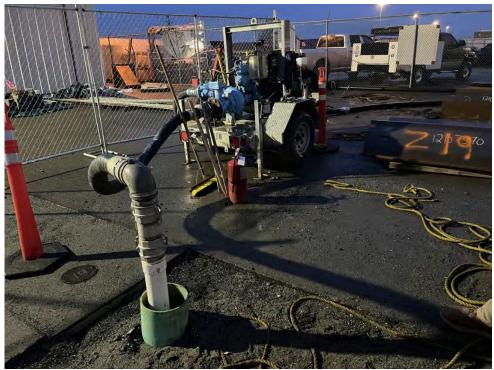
Pump located on northwest corner of site that requires installation of a secondary containment system.
